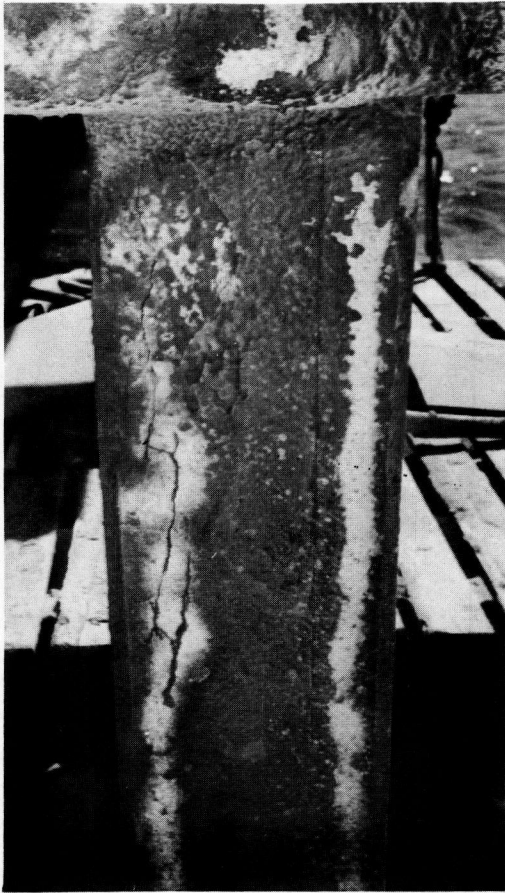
Typical crack along corner of pile. White areas on pile have had asphaltic coating sandblasted off to disclose possible cracks hidden by coating.
